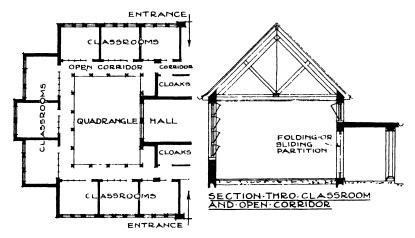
Part plan of 'pavilion' type school with quadrangle, and enlarged section through class-room.
